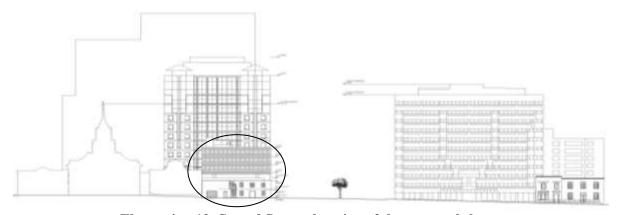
Strand Street elevation of the proposal shown in relation to its surroundings
